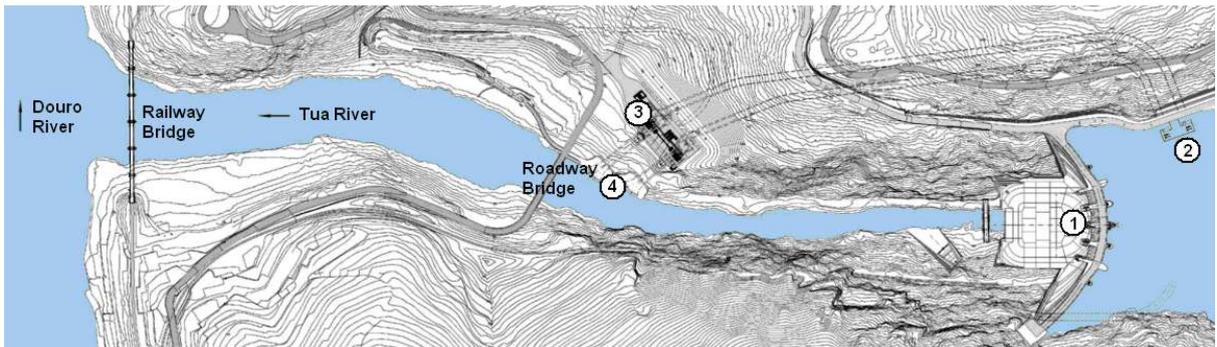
Location of the bridges (Roadway and Railway) and of the hydroelectric power plant components: 1-Dam; 2-Water Intake; 3-Powerhouse and Substation; 4-Outlet [1].
